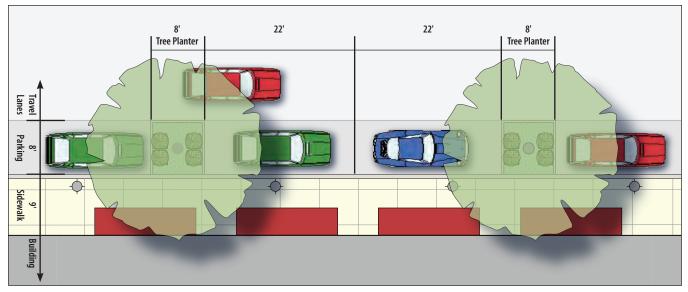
PROPOSED STREET PLAN-34TH STREET, SOUTH OF BUNKER HILL ROAD.
